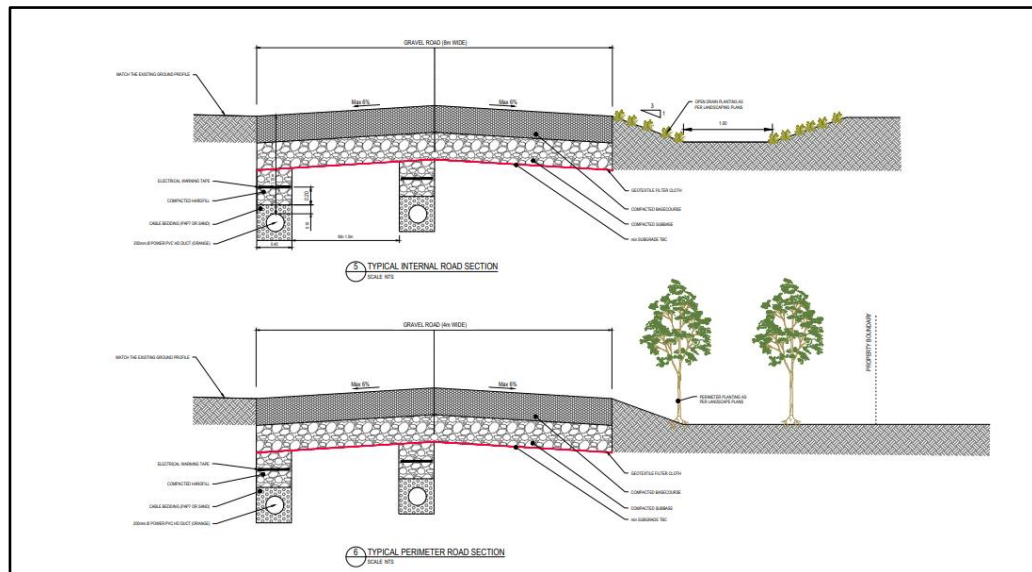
Internal (including perimeter) access road cross section (Source: Beca Civil Design Report)
